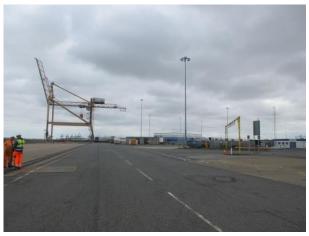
Alternative view looking back at Berth 1 gate exit from the cruise terminal.
